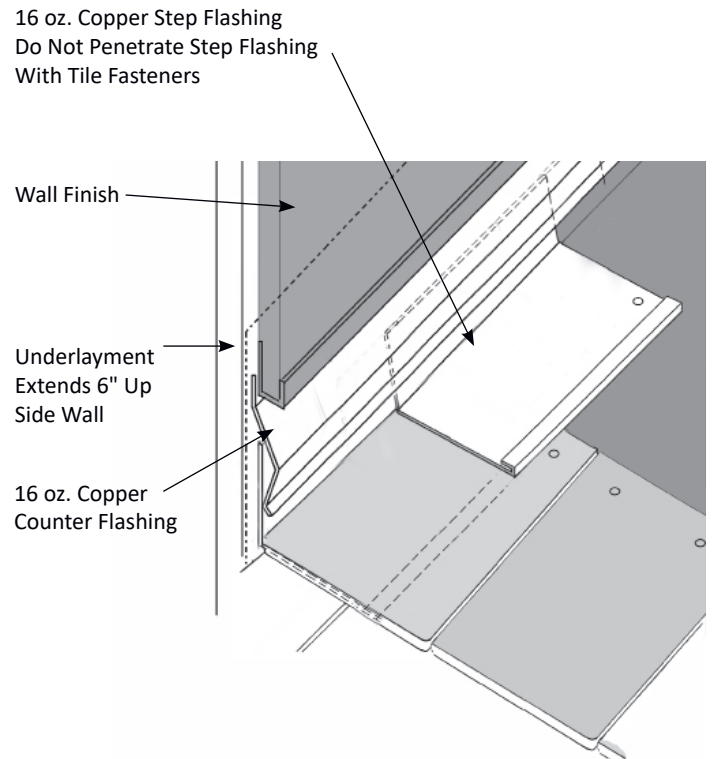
Side Wall Copper Step Flashing With Counter Flashing
